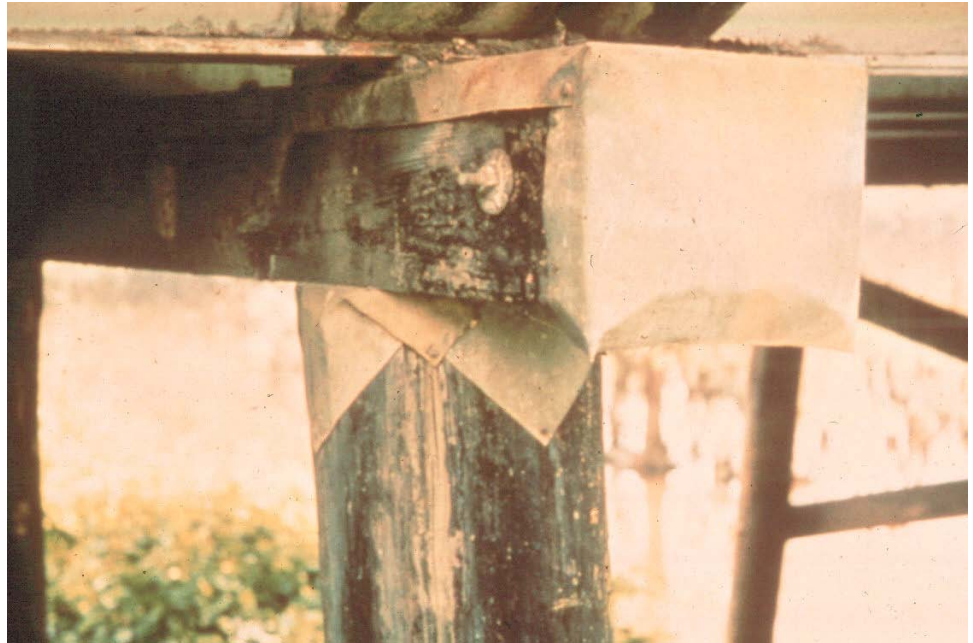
Decay in Timber Bent Cap (Note “Protective” Cover / Flashing)
